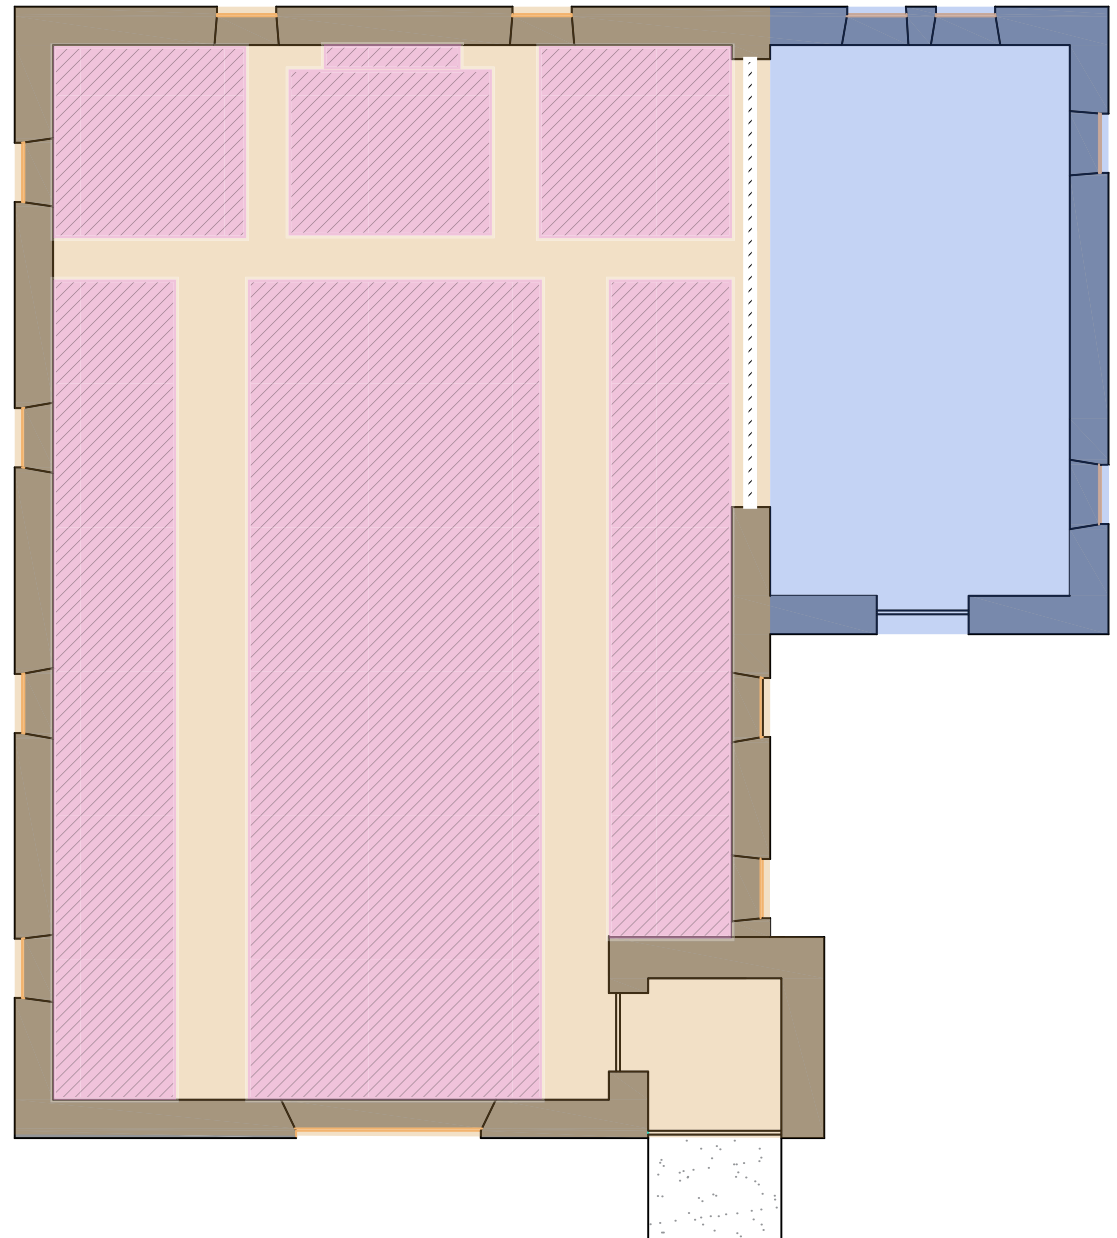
Building phase plan showing known phases of building's construction, Bethesda Chapel, Back Chapel Street, Llanrhaeadr Ym Mochnant, Powys SY10 0JY. Elevation - Scale 1:500 at A4, Plan - Scale 1:200 at A4.
